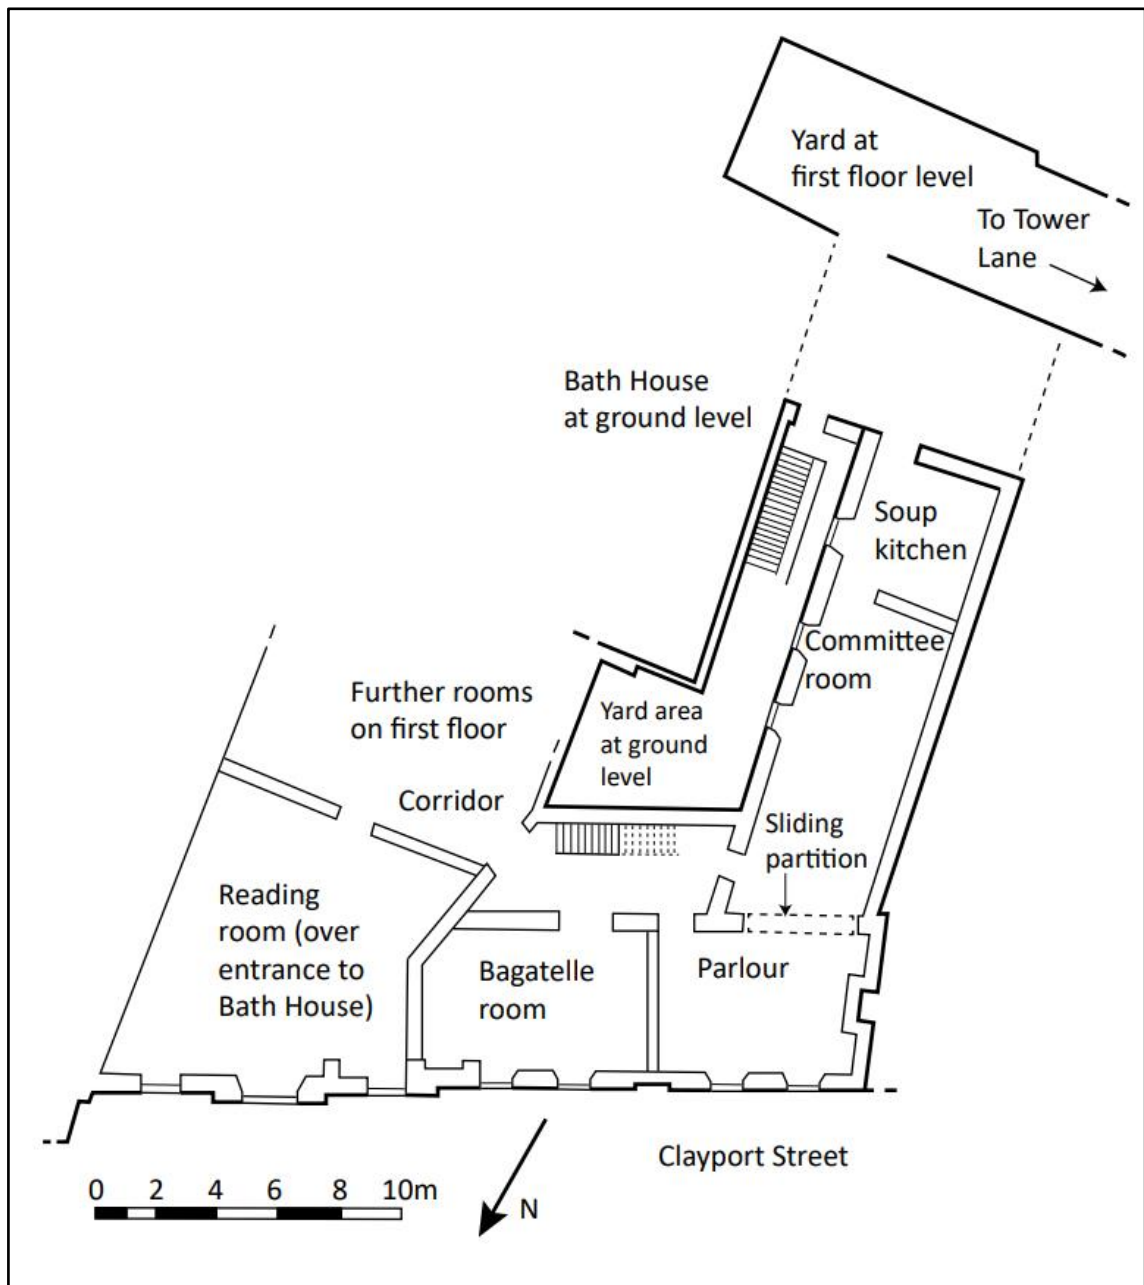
Plan of the first floor of Alnwick Working Men's Club based on AM 21/2/1874: 5; MH 1/1/1876: 2.
